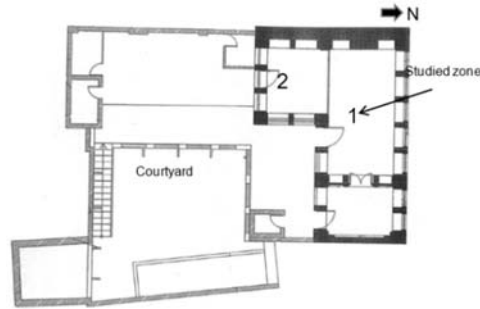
First floor plan for Abdullah Al-Zayed's house [12]
